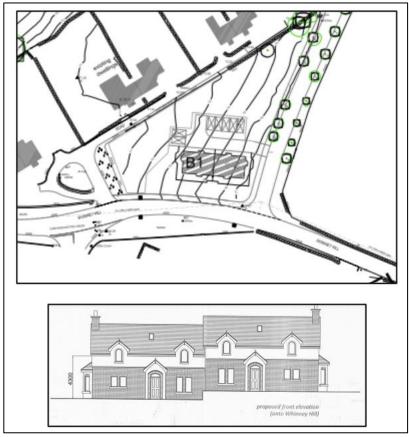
Siting and design of Building B1 fronting Whinney Hill
